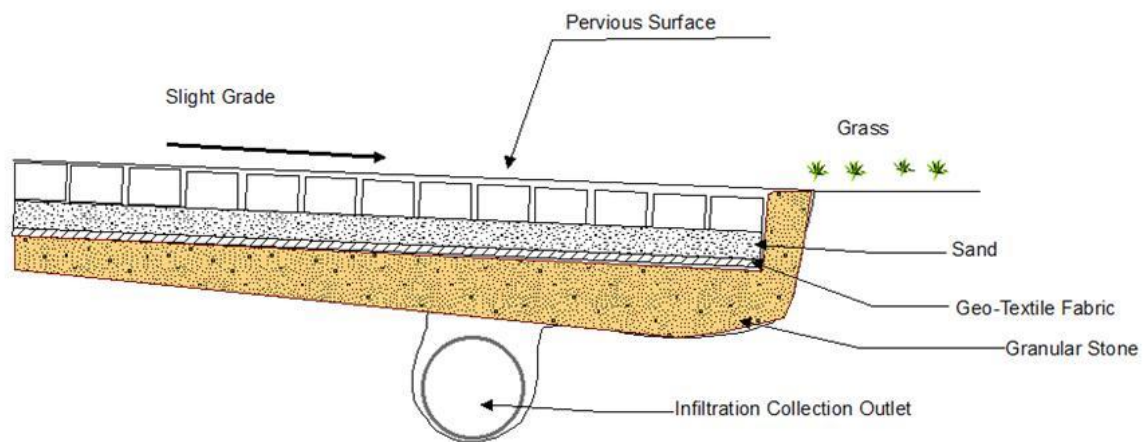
Typical Cross Section of Porous Paving cross Section Constructed Wetland
